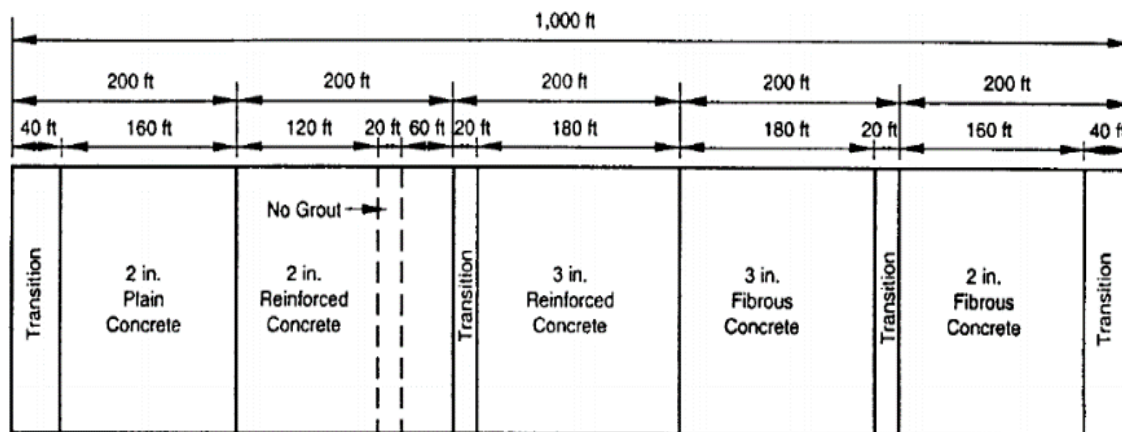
Plan view of experimental sections on Loop 610 South in Houston, showing details of design and layout
